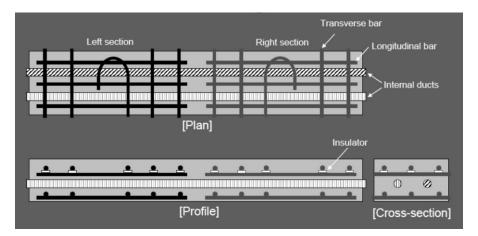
Schematic diagram of reinforcing bar location in concrete slabs (Lee⁸)
